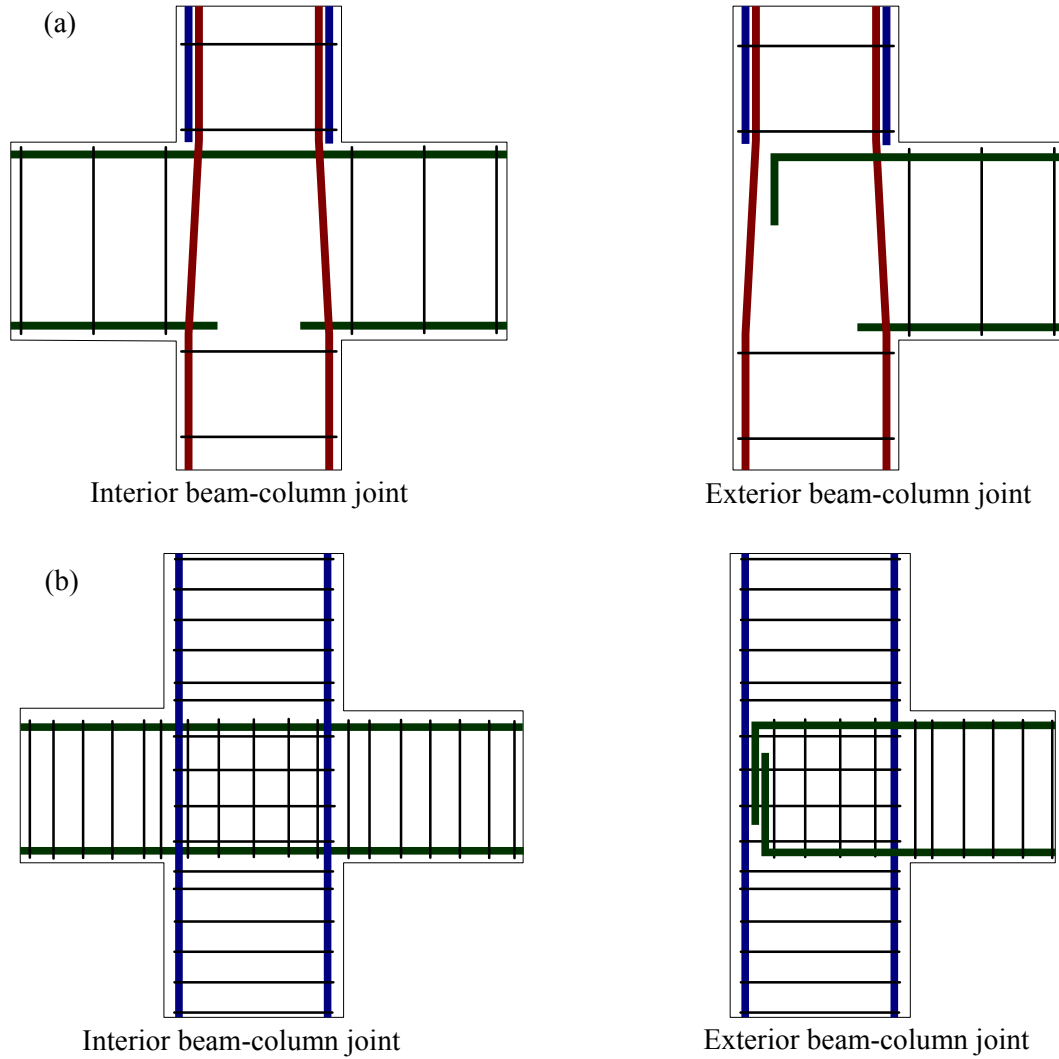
Typical RC beam-column joint details for pre-1971 ACI codes and current design codes: (a) non-seismically detailed beam-column joints; (b) seismically detailed beam-column joints
